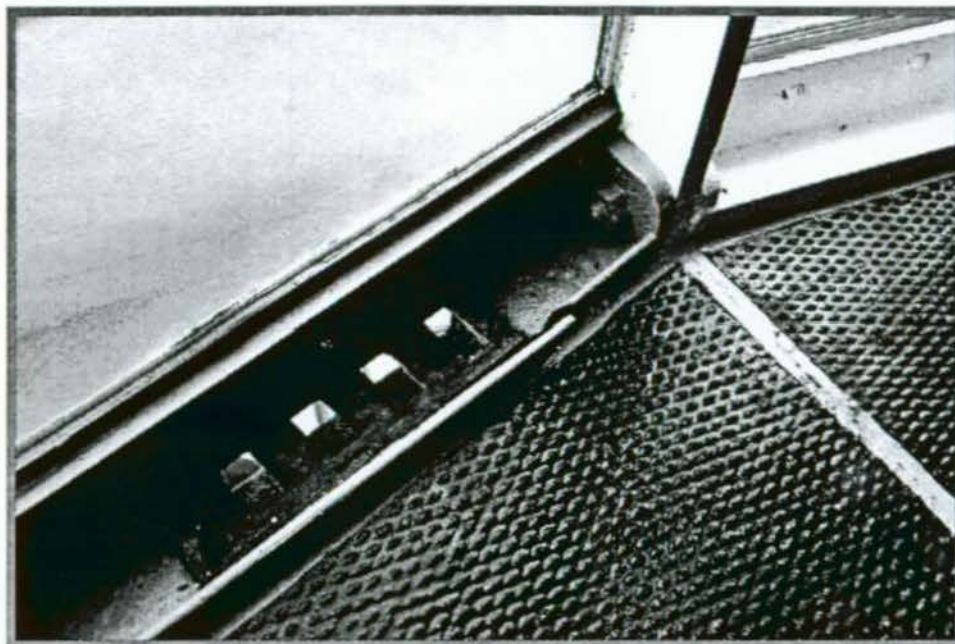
A base plate in the second gallery level interior decking. The cast iron sill plate has been sheared due to corrosion.
